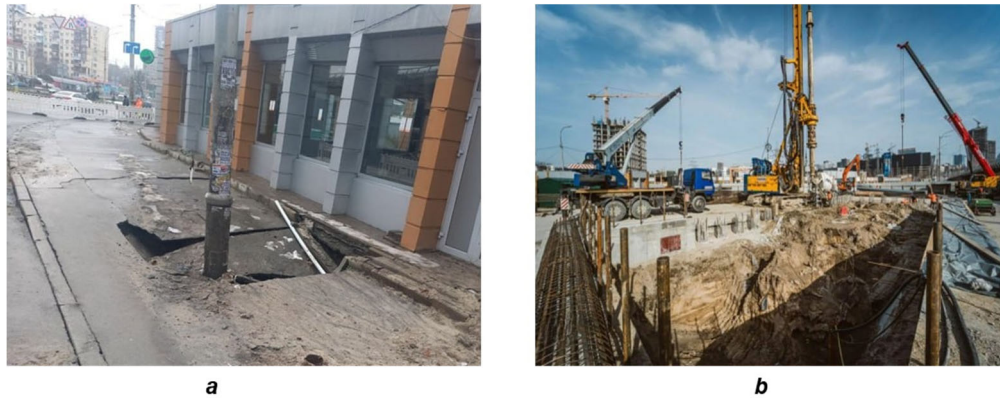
Surface deformation (a) and repair work on the tunnel section (b)
